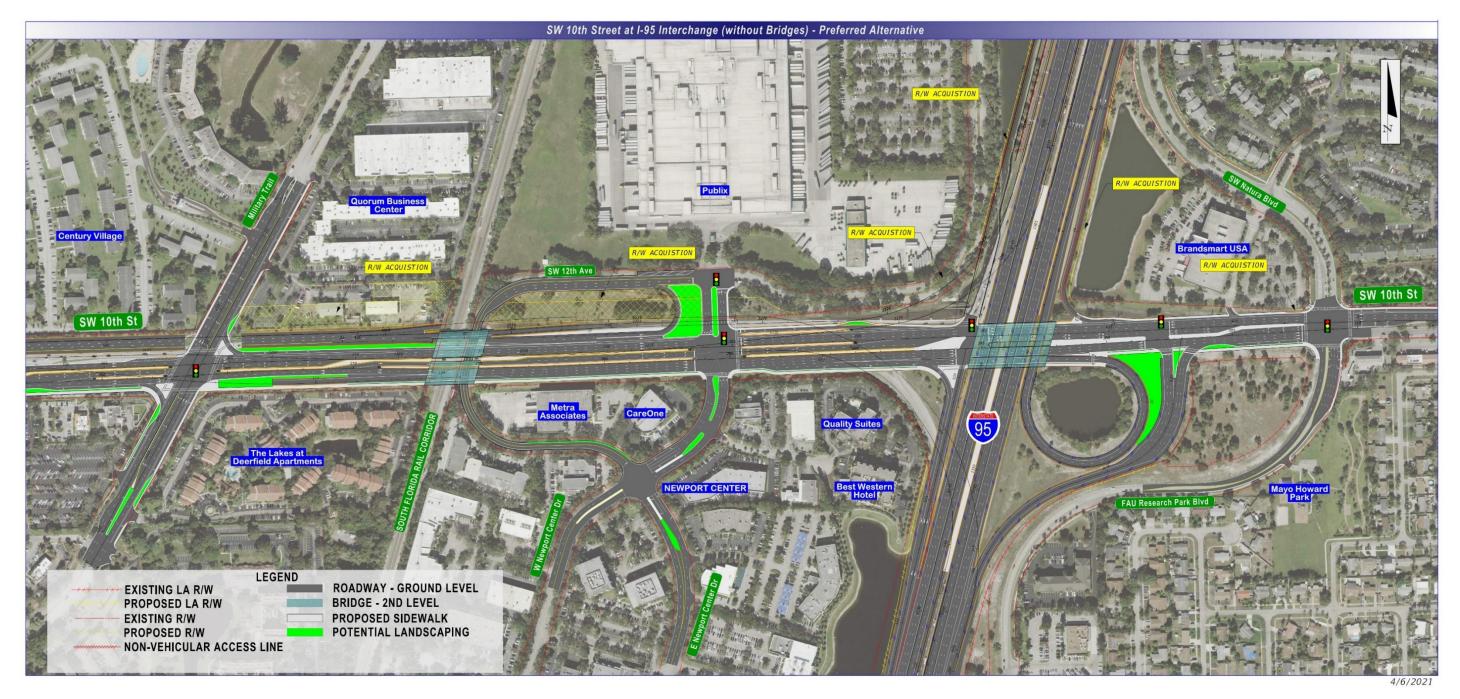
SW 10th Street – North Alignment Concept Plan (2 of 2)
